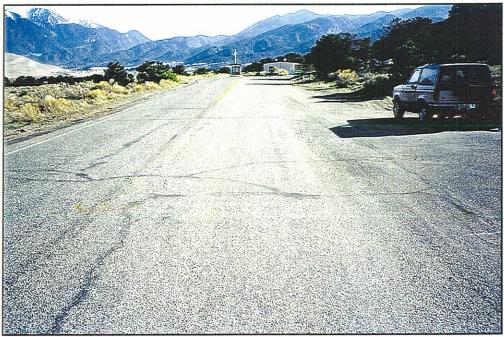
Section 4, Sample Unit 1 (MP 2.67)
